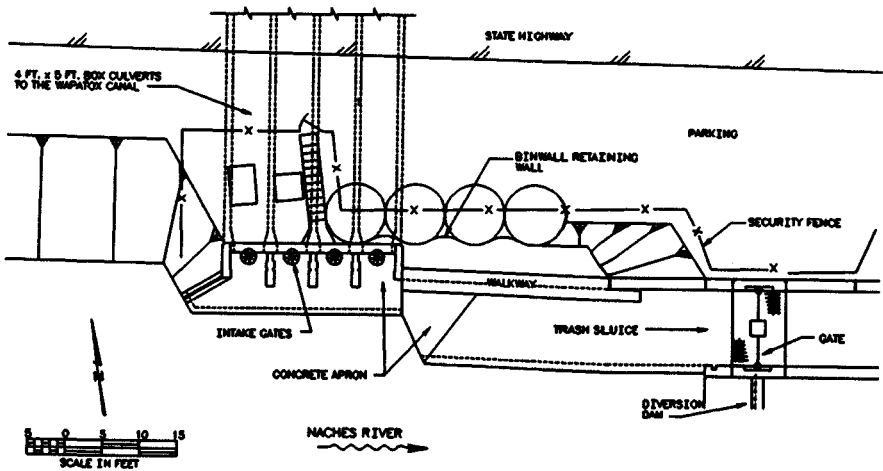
Naches Hydroelectric Project – Before Modification
